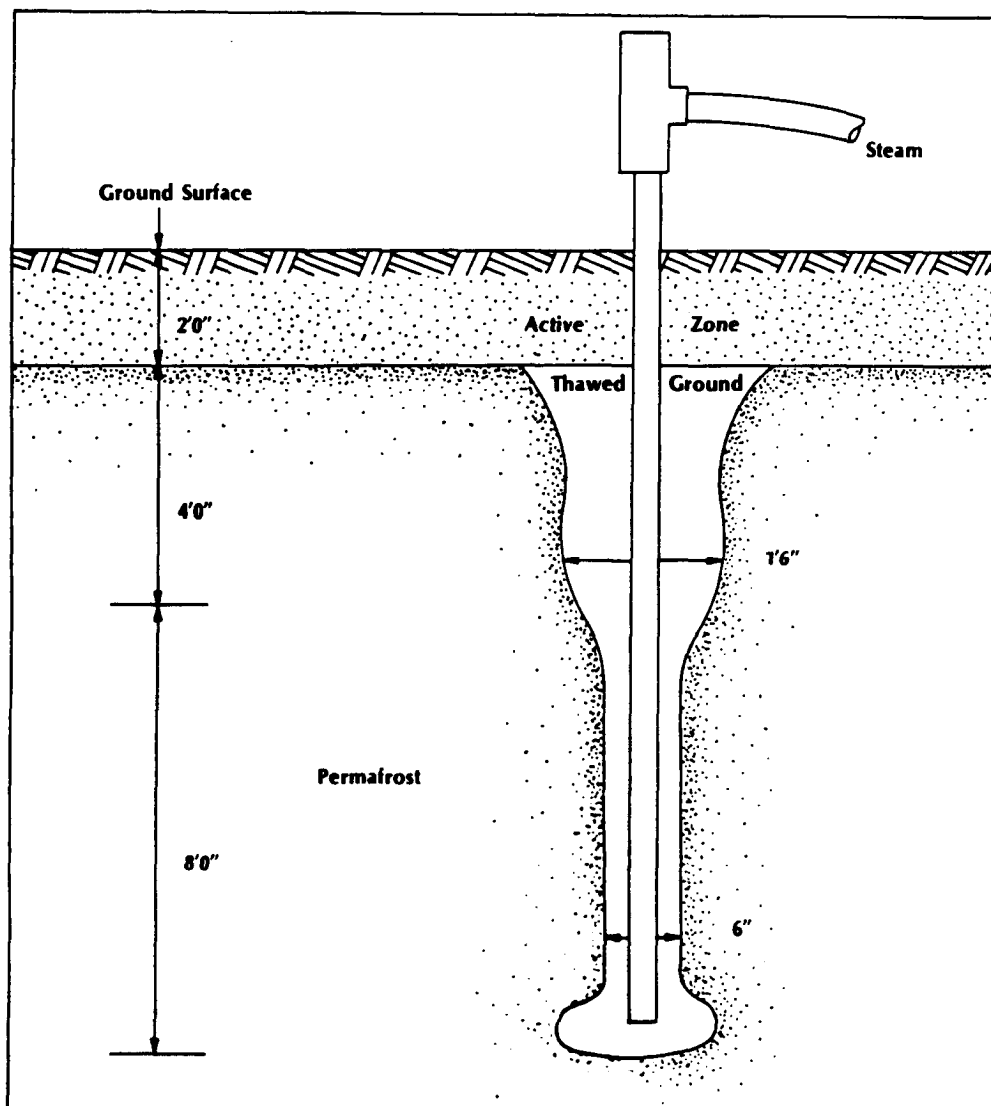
Approximate shape of thawed hole in sand-silt soil after 1½ hours of steam jetting
